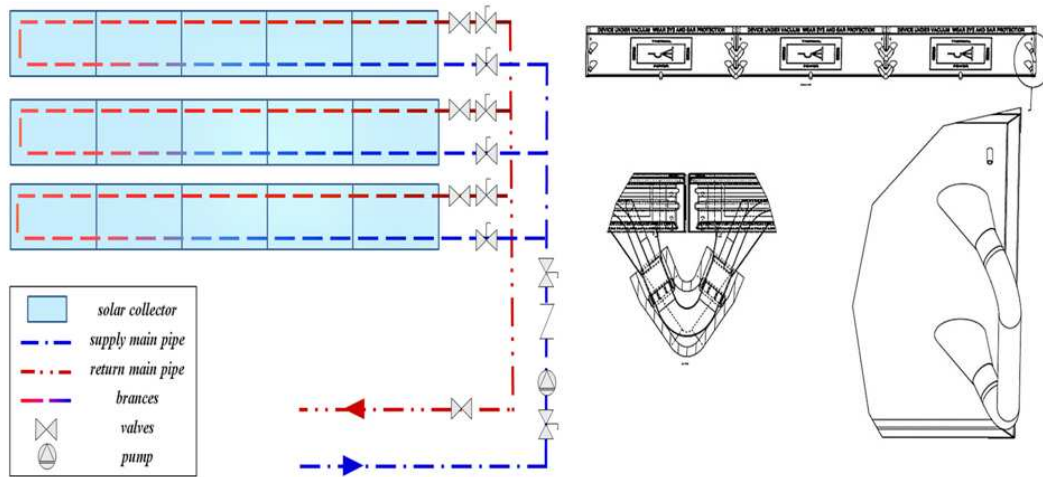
Schematic of the solar field layout (left) and details of the interconnecting parts (right)
